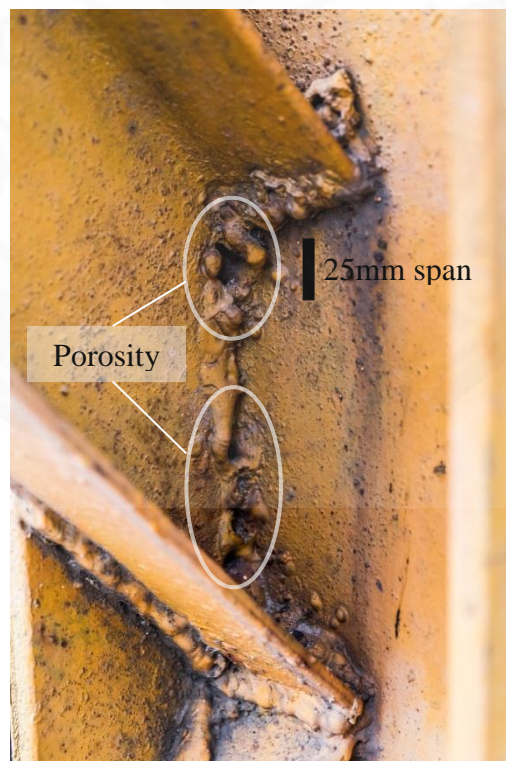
Welding defects on Billboard A (joint 3)
